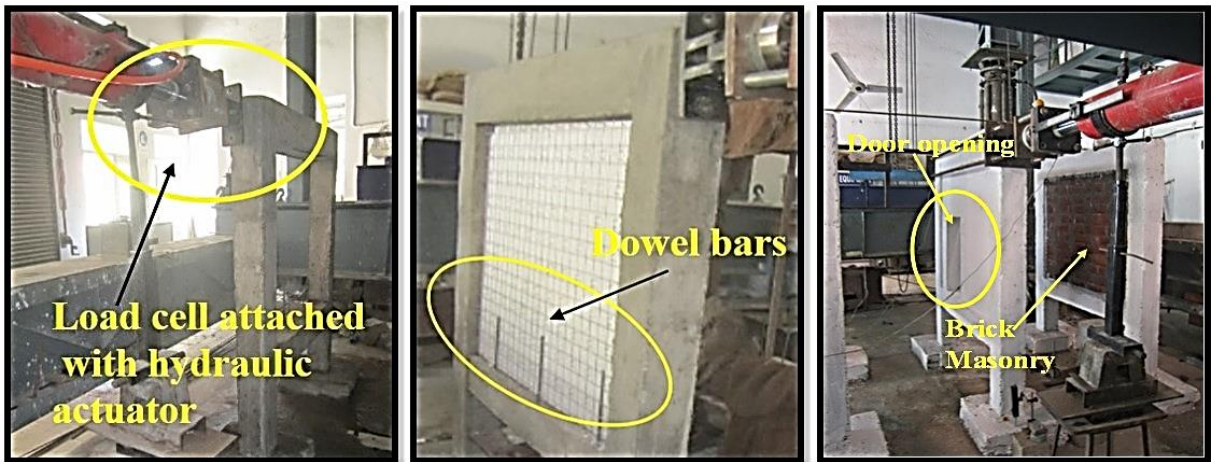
39: Intermediate phase of RC frames (a) Load cell attached with hydraulic jack and placed in position; (b) specimen with concrete sandwich panel being placed in between dowel bars; (c) specimen with door opening and brick masonry as infill
